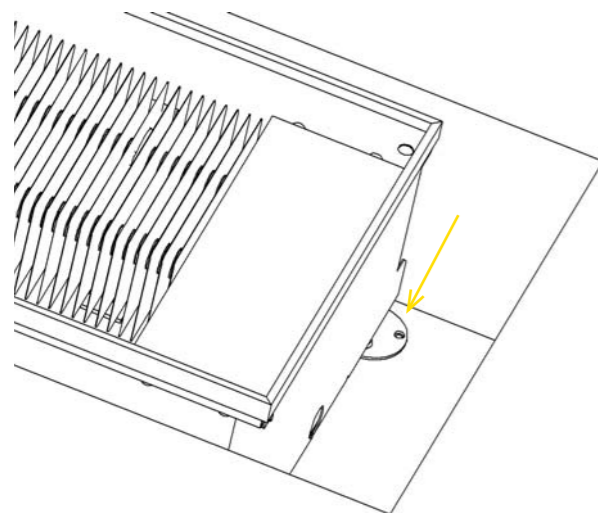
Place the convector in the installation hole and mark feet mounting holes
